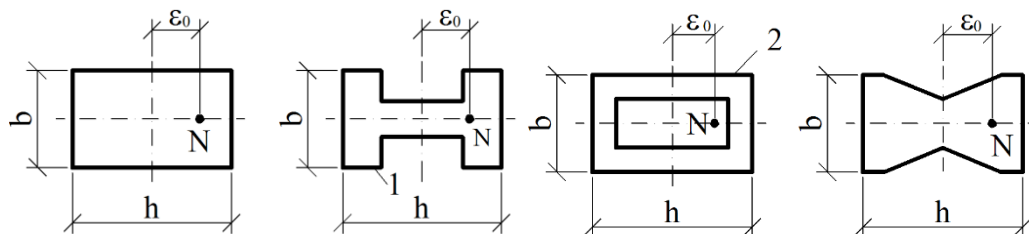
Indirectly reinforced optimal sections of compressed reinforced concrete diaphragms of shells made of "P" elements at eccentricities $e_0 > e_a$ - I-beams and box sections made of "P" elements.
